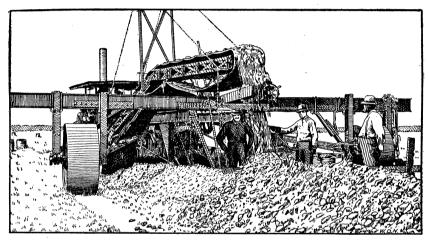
Back-filling belt conveyor, attached to machine J.
